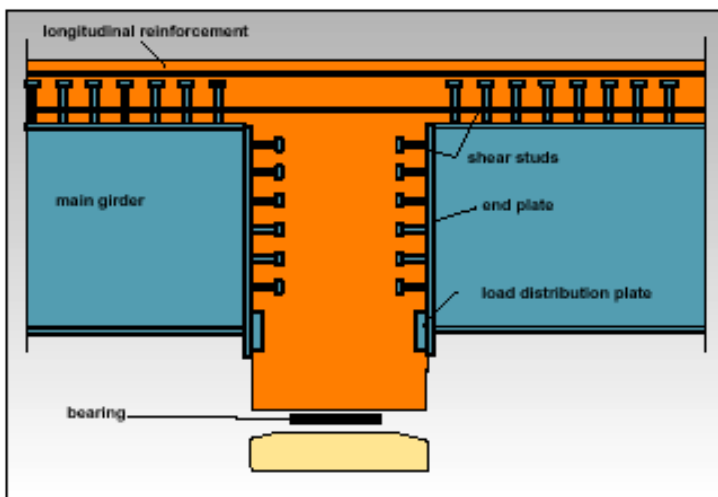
Concrete connection of main girders. - Cross section through bracing (schematic)
